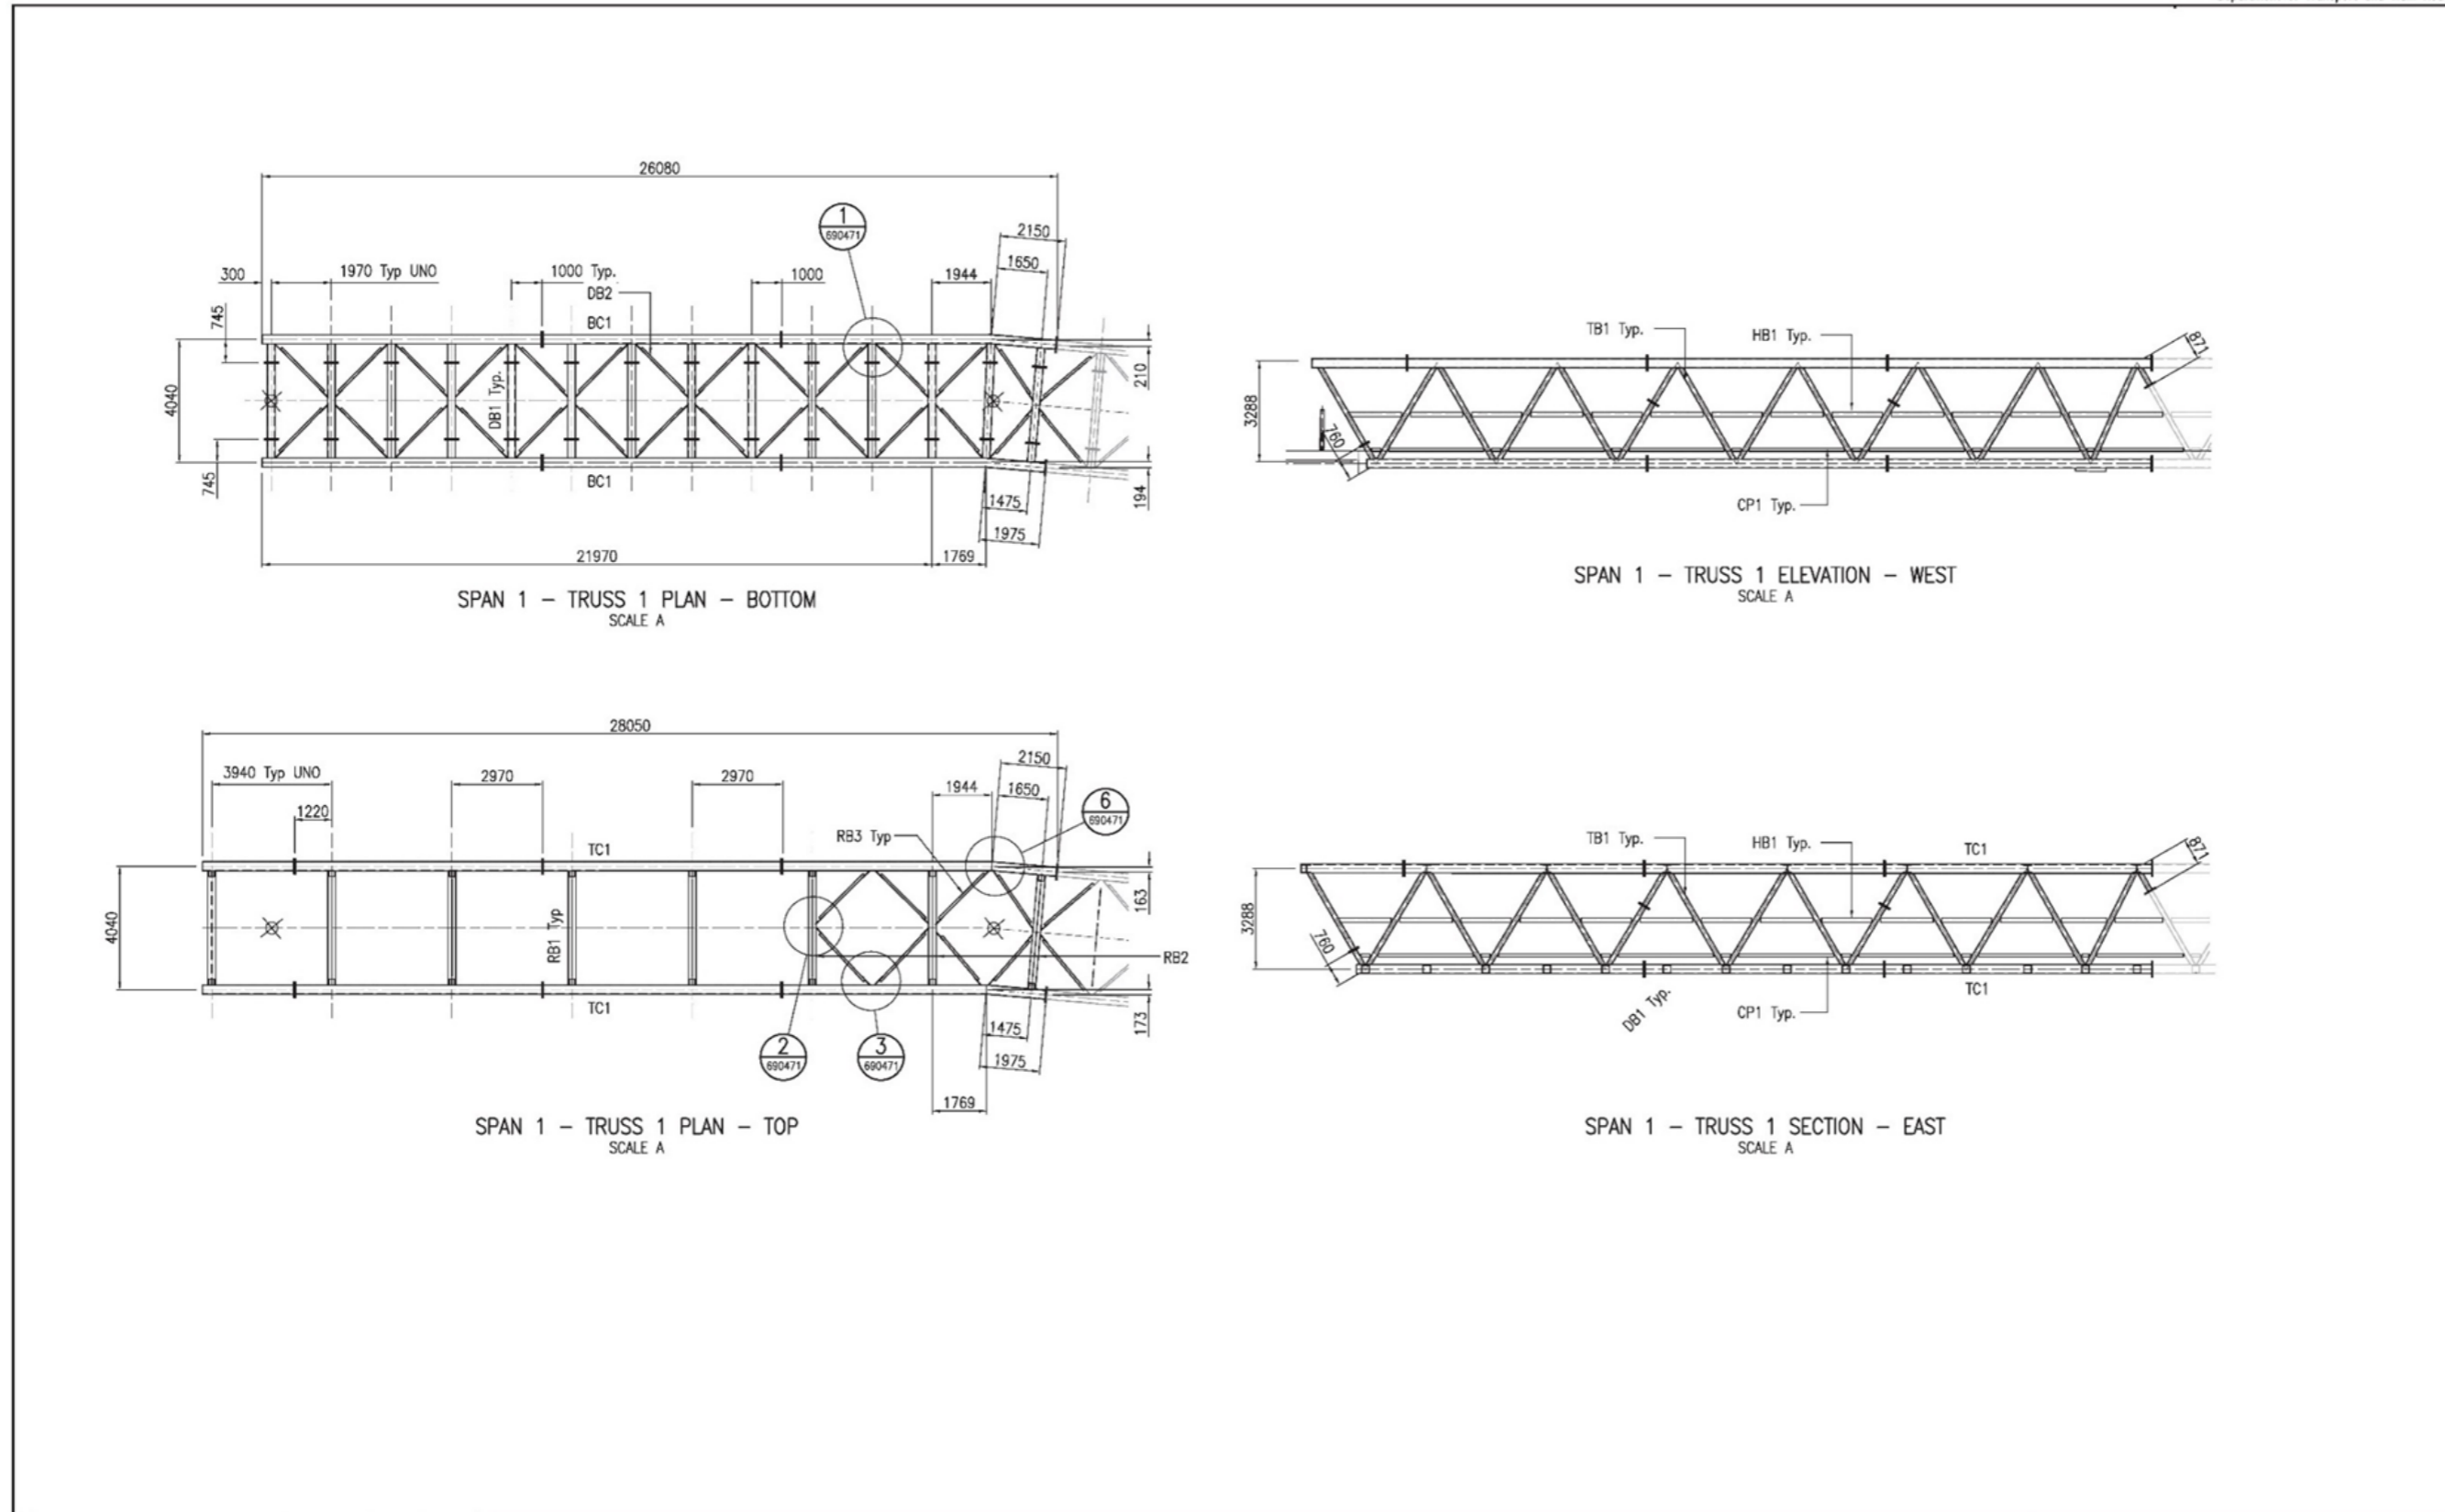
(c) - Example drawing of steelwork sections and details of truss assembly
